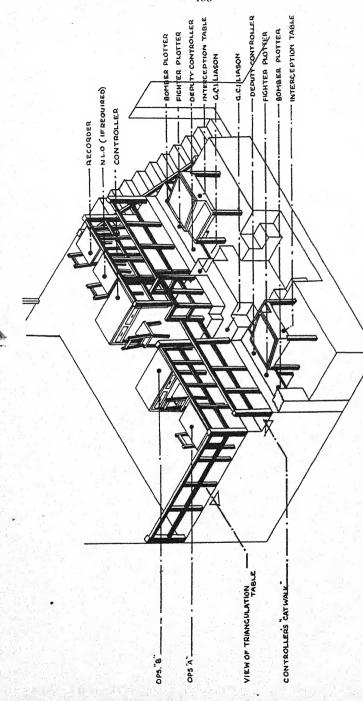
SECTOR OPERATIONS ROOM—TYPICAL DESIGN OF CONTROLLER'S DAIS
